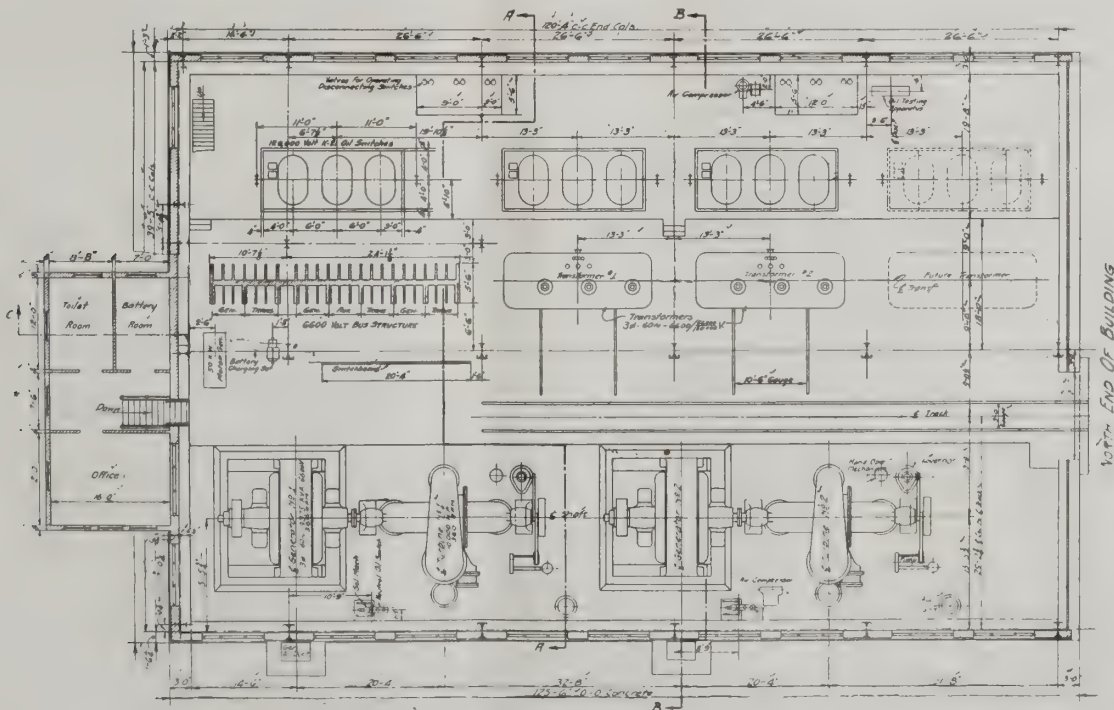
Main Floor Plan, Ocoee Plant No. 2
